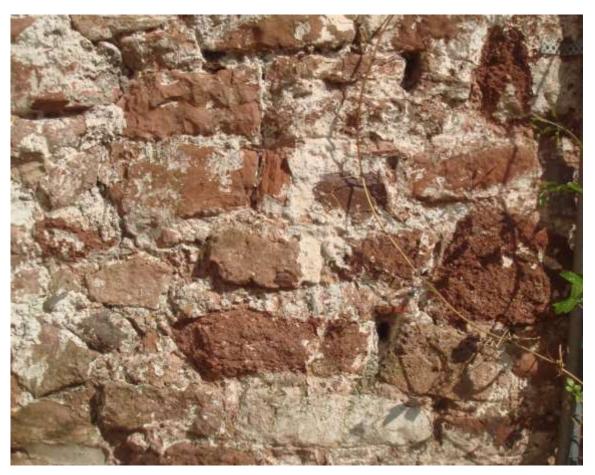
Detail of the rear (boundary) wall at 30-32 Longbrook Street showing the Heavitree and red sandstone blocks of the wall fabric.
